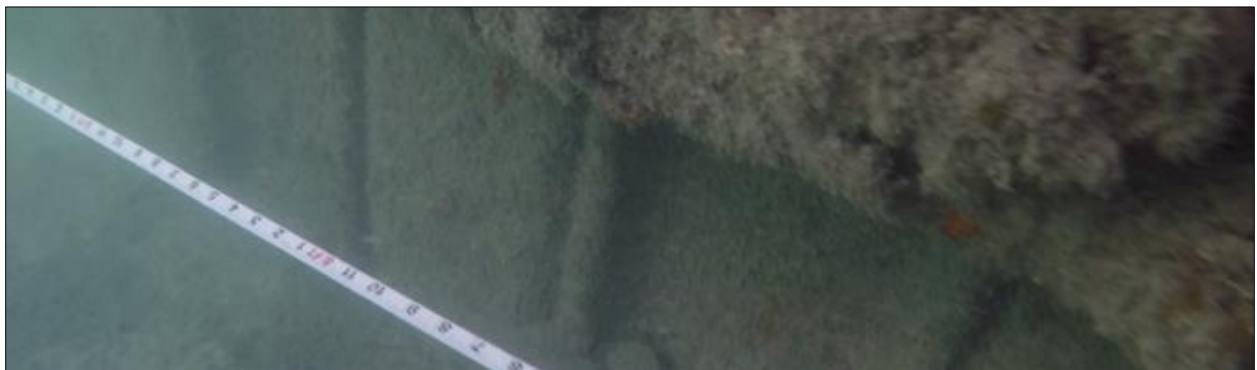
At 5' from start of Phase 2 wall segment beginning at corner of William St.
